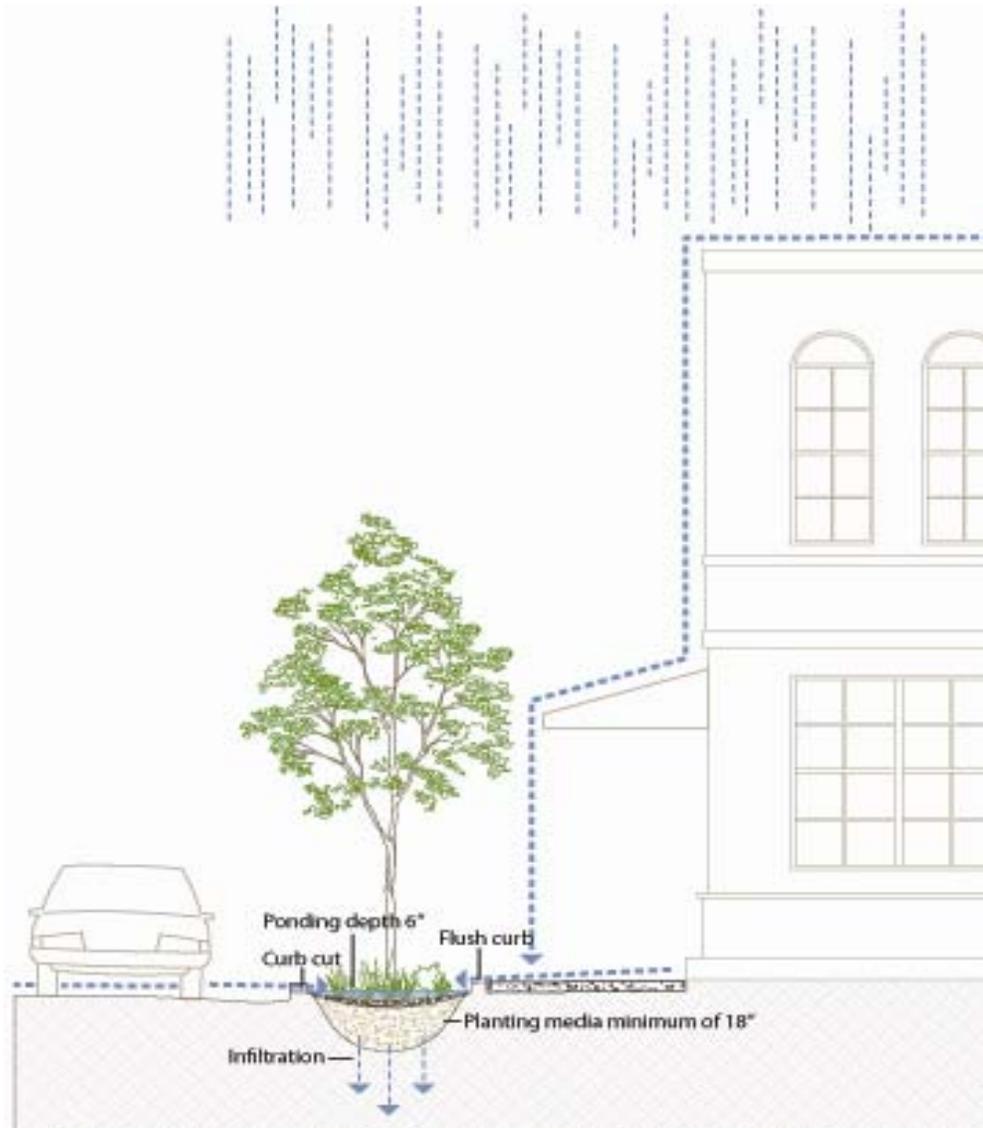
Schematic of a bioretention/rain garden BMP with no underdrain; treated stormwater infiltrates into surrounding soils.
